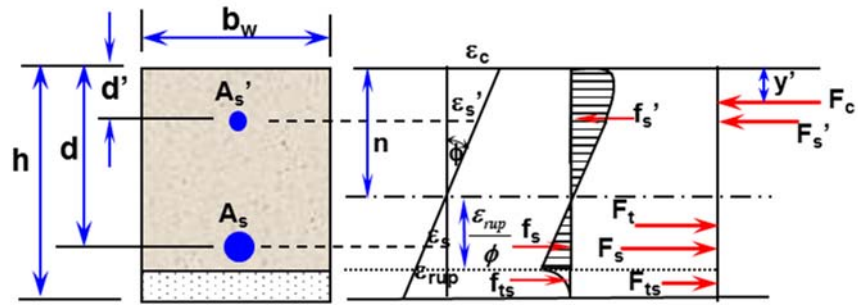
Internal loads of a typical reinforced concrete section.
